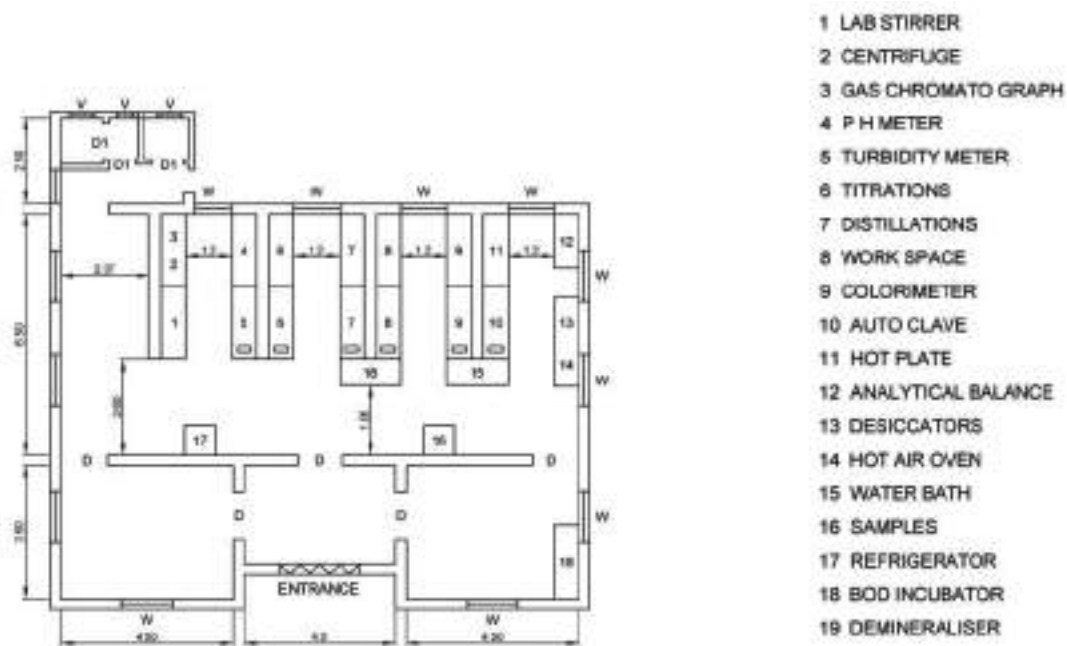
Typical layout and list of equipments for sewage treatment plant control laboratory
